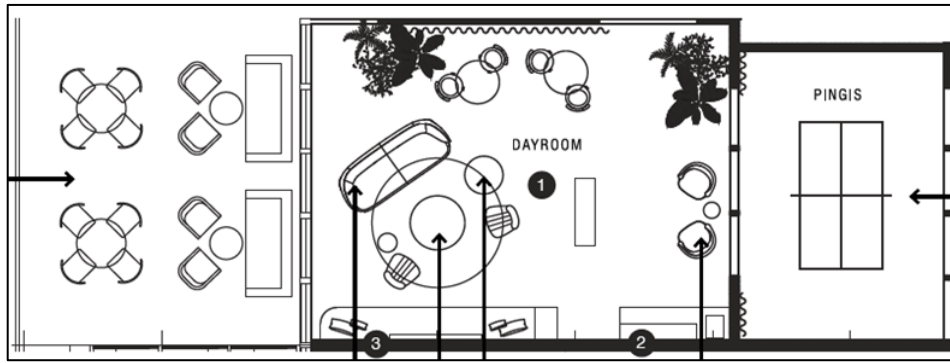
Floor plan of the deck, dayroom, and ping-pong room
